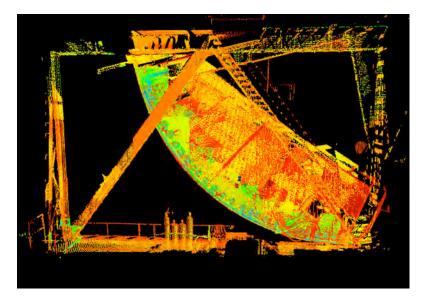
3-D Laser Survey – Elevation of Track Girder
